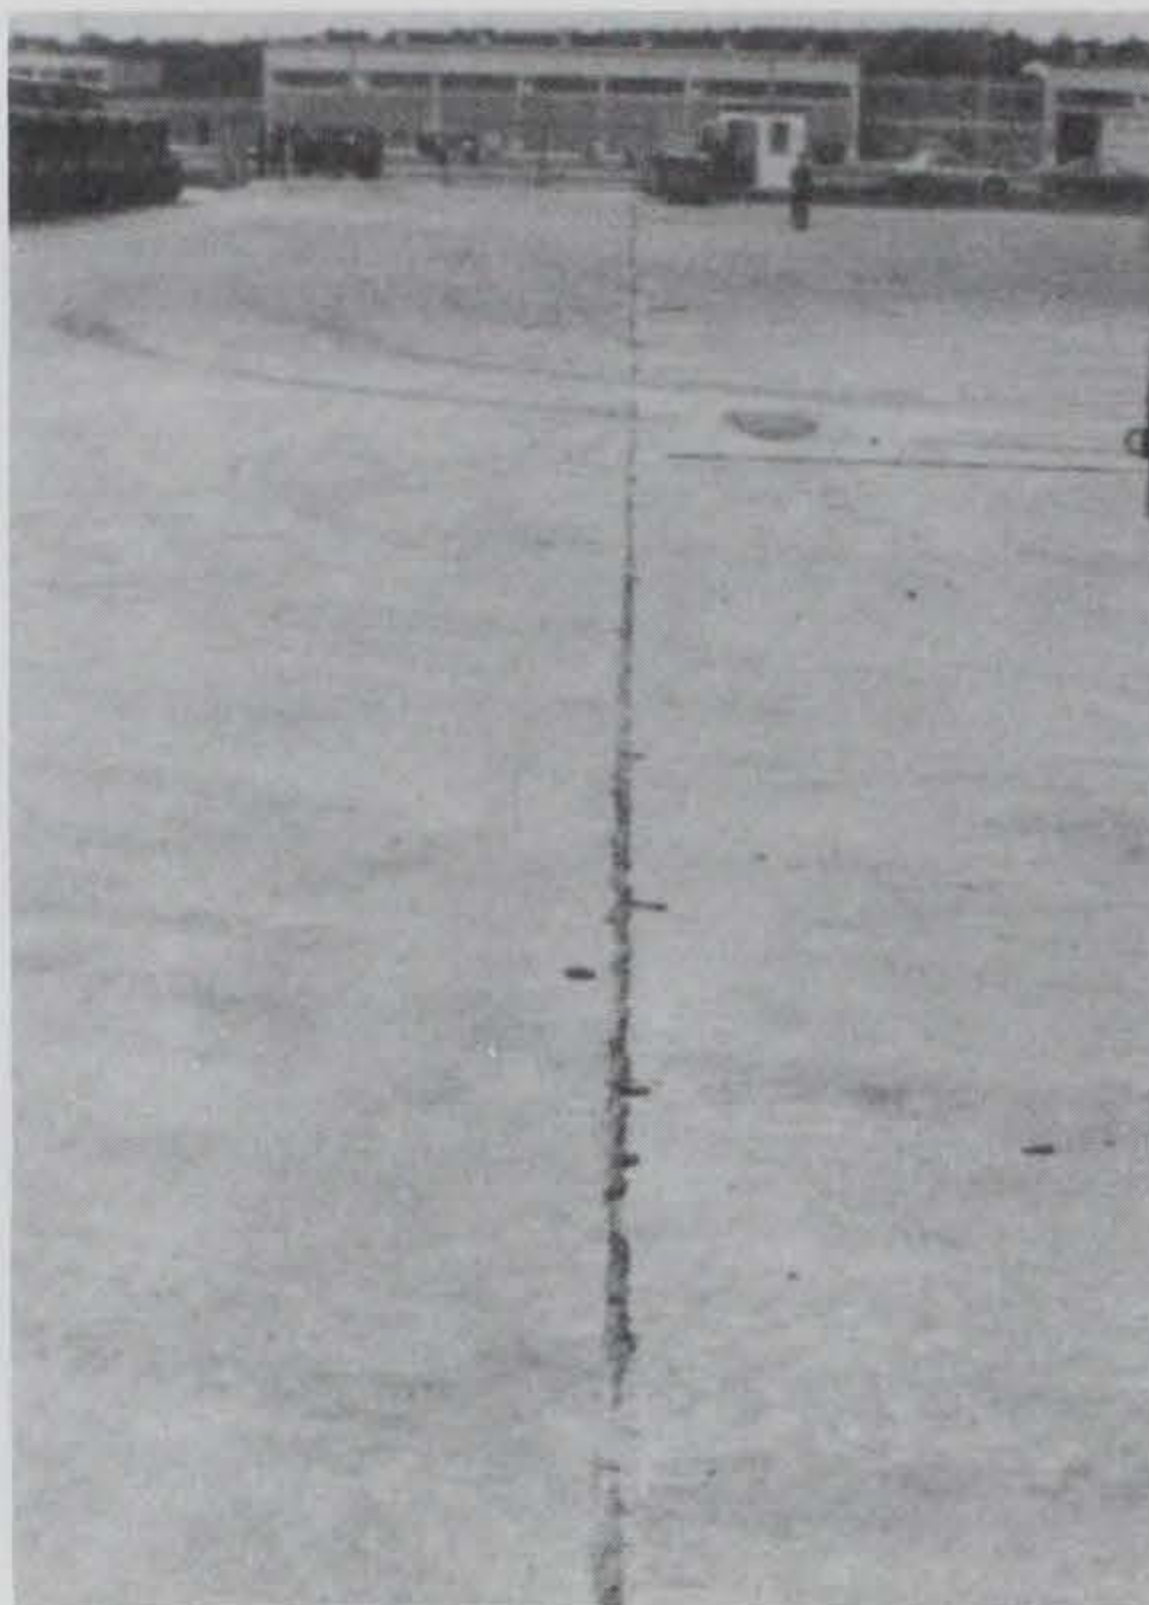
The cold joints were overfilled with joint sealer, causing extrusion of the sealer in hot weather and tearing of the sealer under tank traffic
